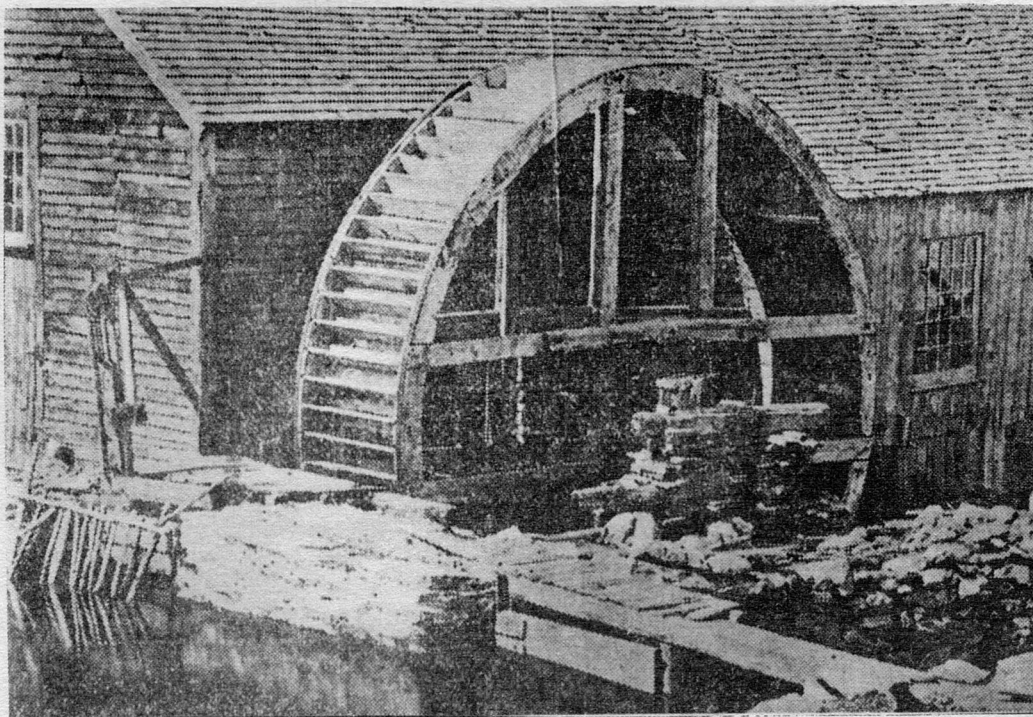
Detail of dam, sluiceway, and water wheel. Window to right of wheel indicates later extension of building.
